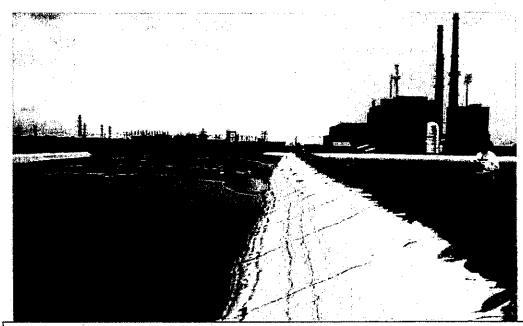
West Pond, Center Berm. Note slight bulge in liner at water and sediment interface.
